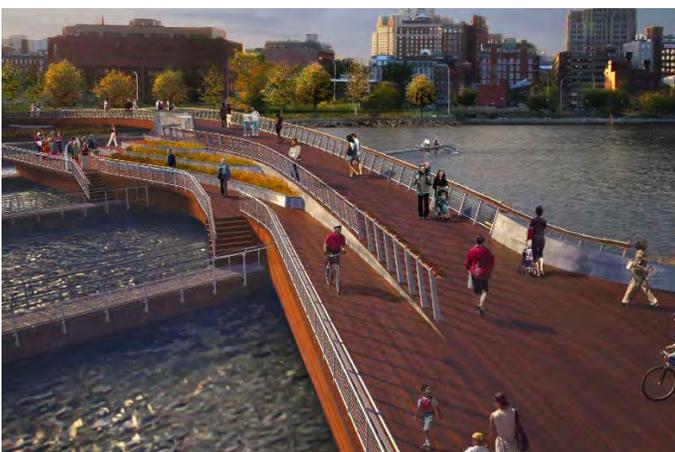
Example of a pedestrian/bike bridge. Photo credit: <http://www.gcpvd.org/2015/06/22/news-on-the-providence-river-pedestrian-bridge/>
